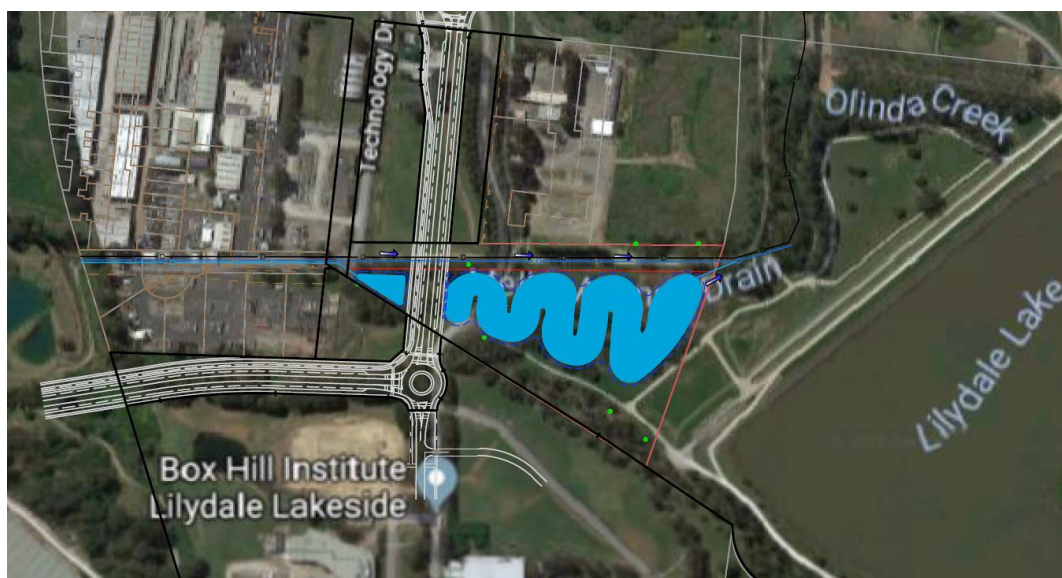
Proposed Melba Avenue Main Drain Catchment Outfall
